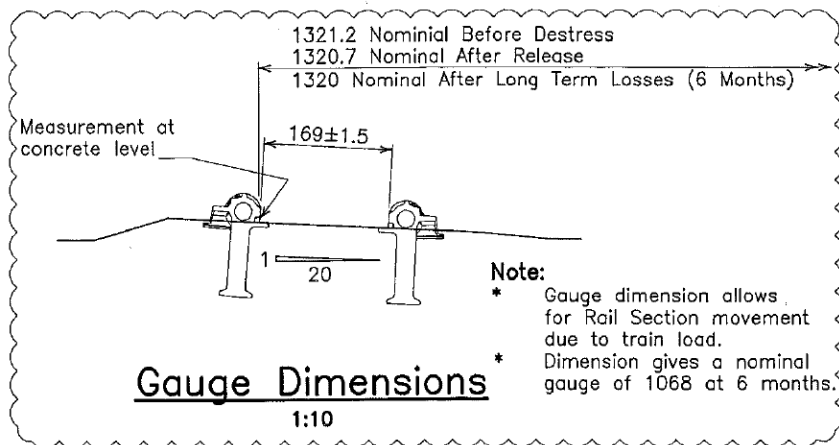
Standard Drawing (September 2011), identifying how a gauge narrower than 1068mm is designed, as it assumes movement will occur over time, depending on the frequency of train tonnage, but a nominal gauge of 1068mm could be expected after 6 months.
